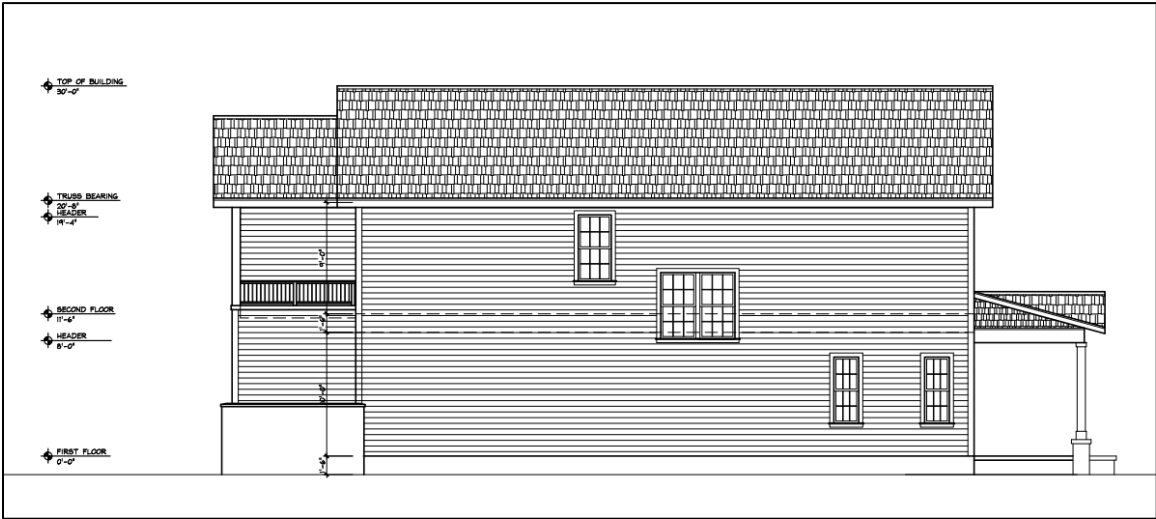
North elevation (to face neighboring property at 345 Lang Ct. N.) of proposed residence
